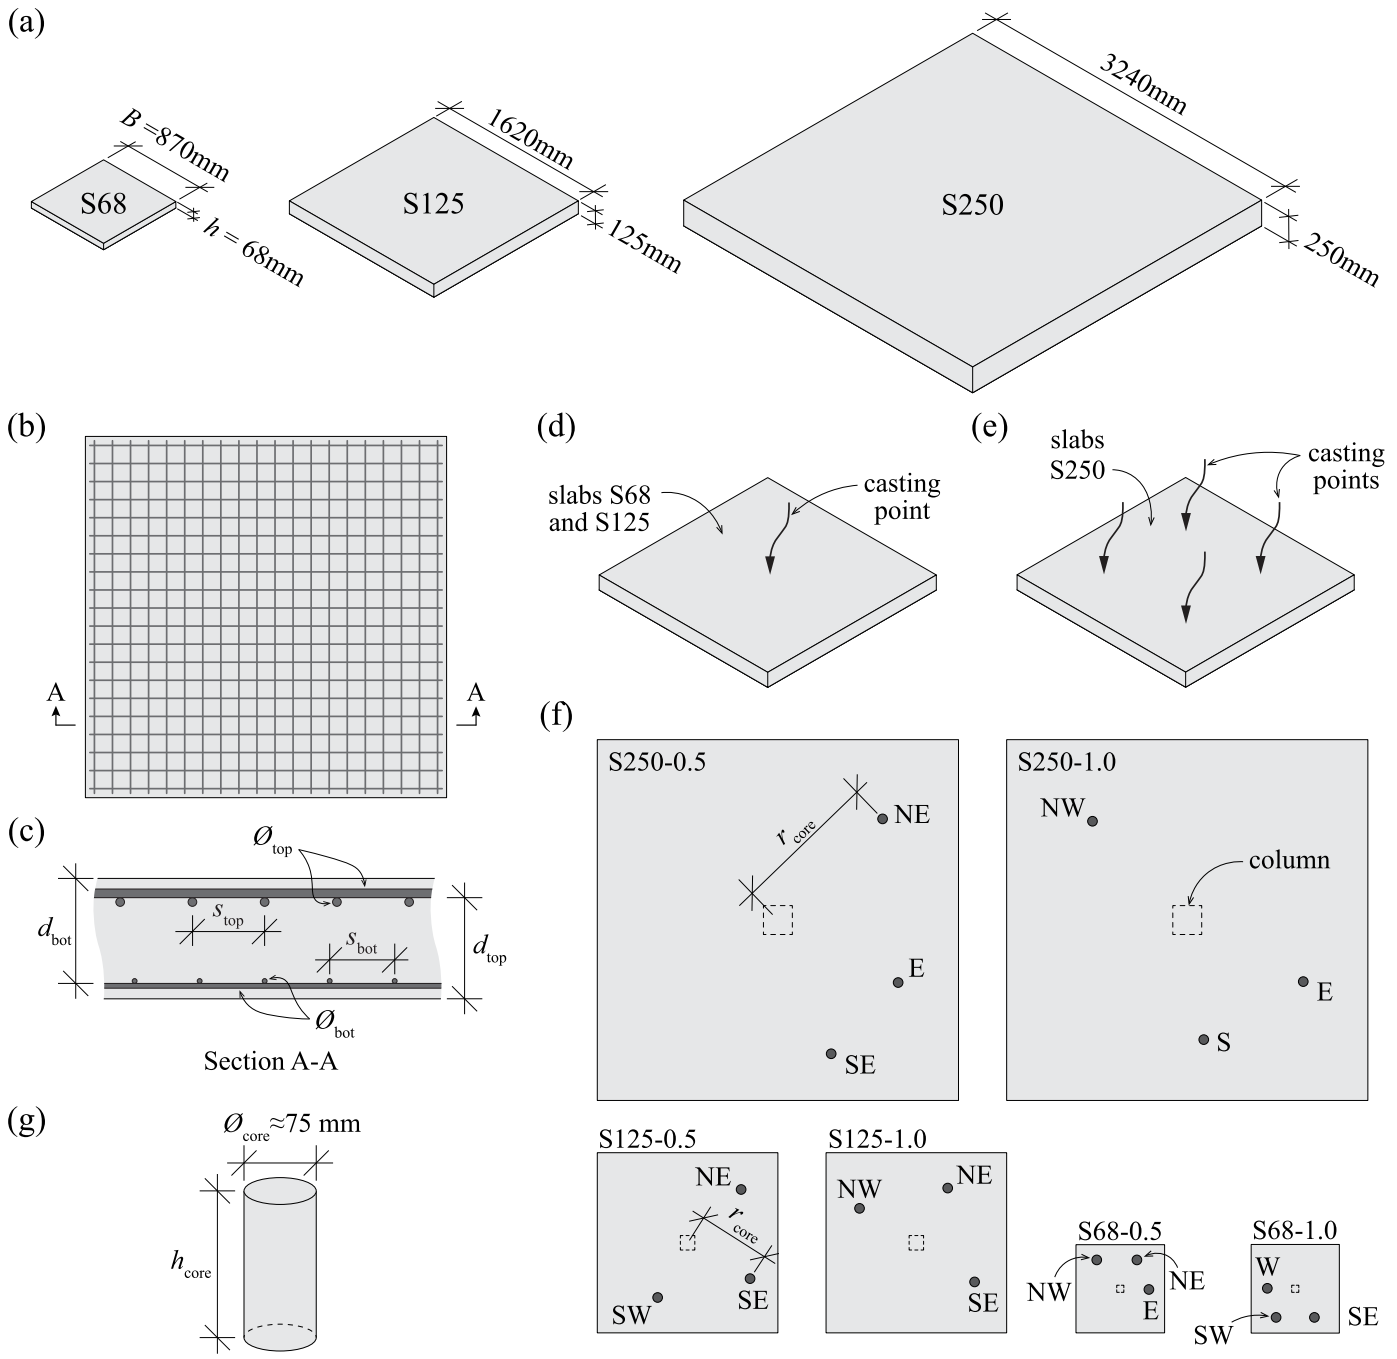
Information of slabs: (a) main slab dimensions; flexural reinforcement arrangement (b) in plan view and (c) along cross-section A-A; (d) casting point for slabs S125 and S68; (e) casting points for slabs S250; (f) location and identification of the scanned cores in each slab; and (g) core geometry.
